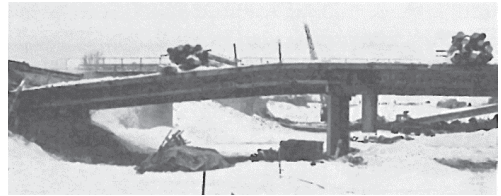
The Tingstad Bridge during loading using imposed displacement at the abutment (Bådholm et al. 1967a).
